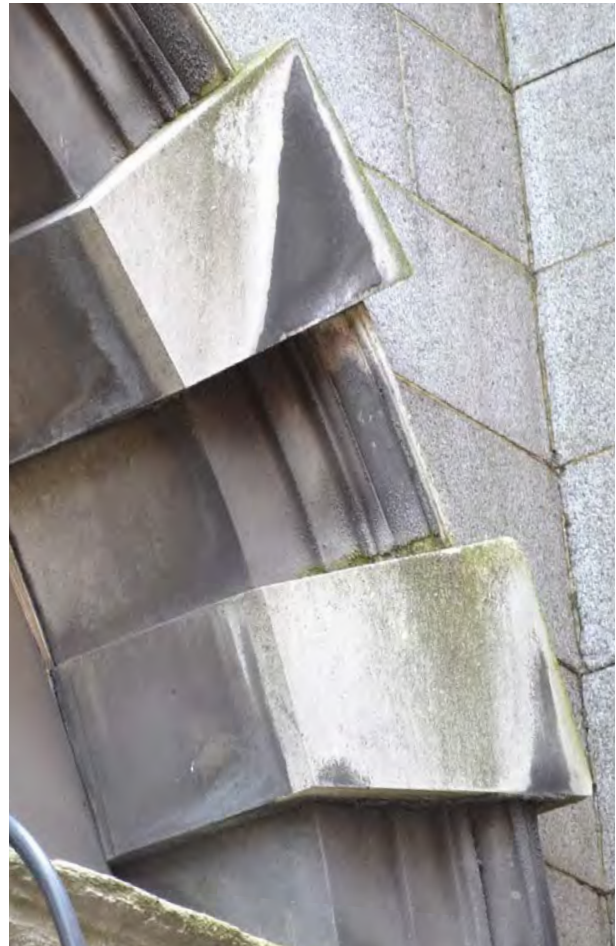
Detail of blocking to voussoirs of arched window in passage.
